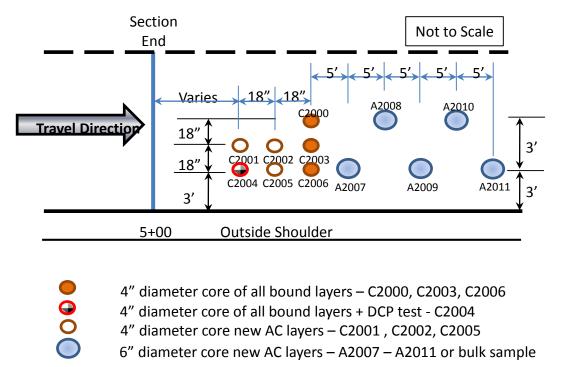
Standard sampling plan locations at leave end of test sections for new AC
